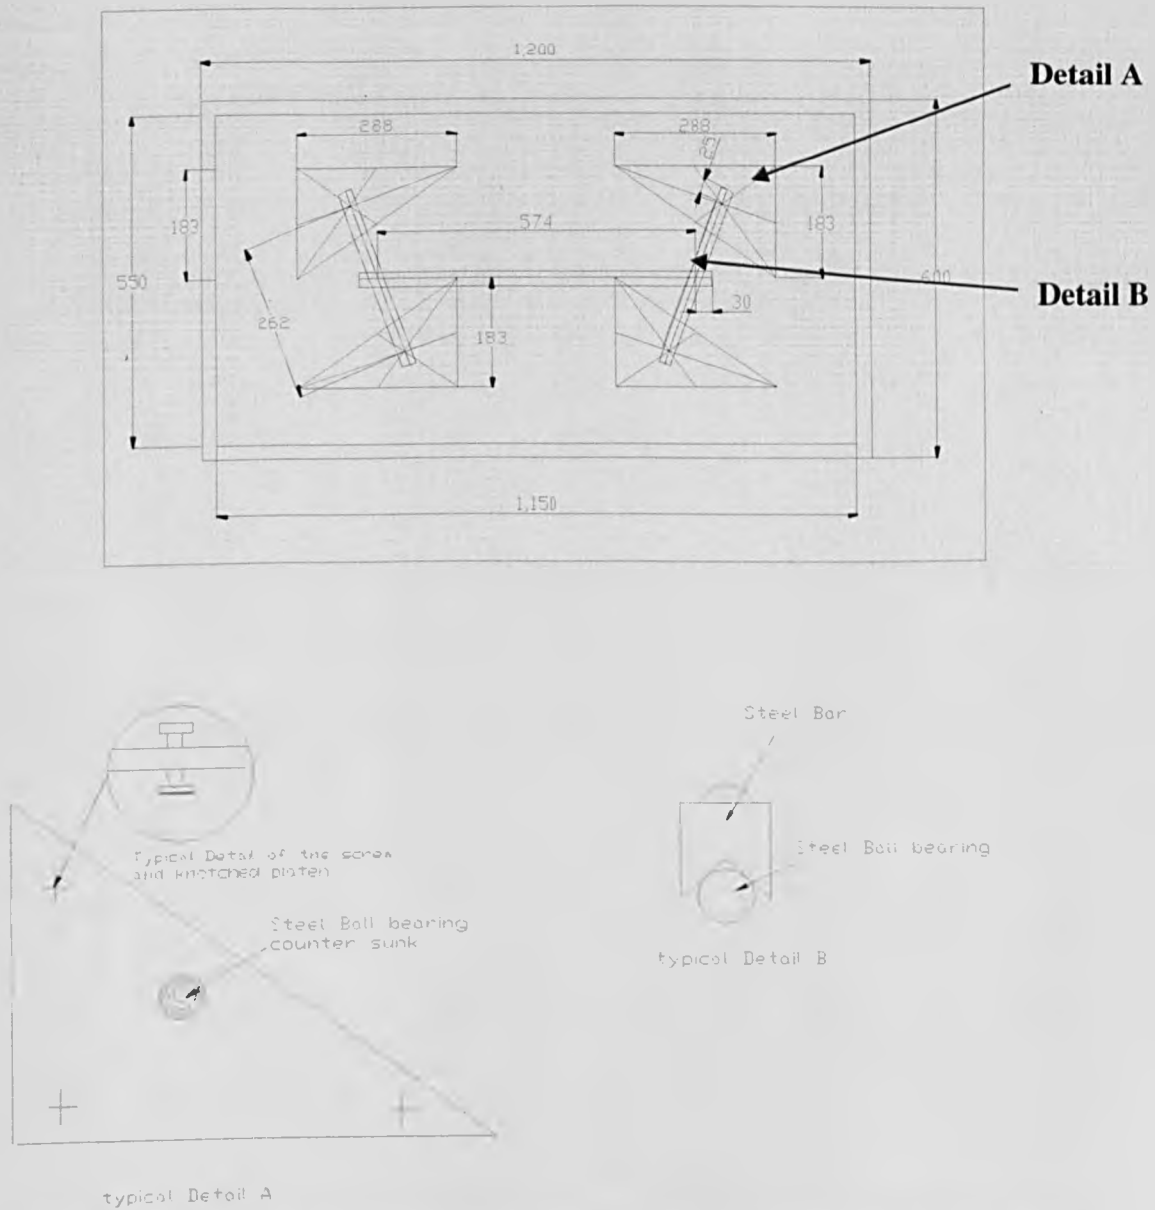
Typical detail of triangular platen and steel bars for rectangular slabs.
